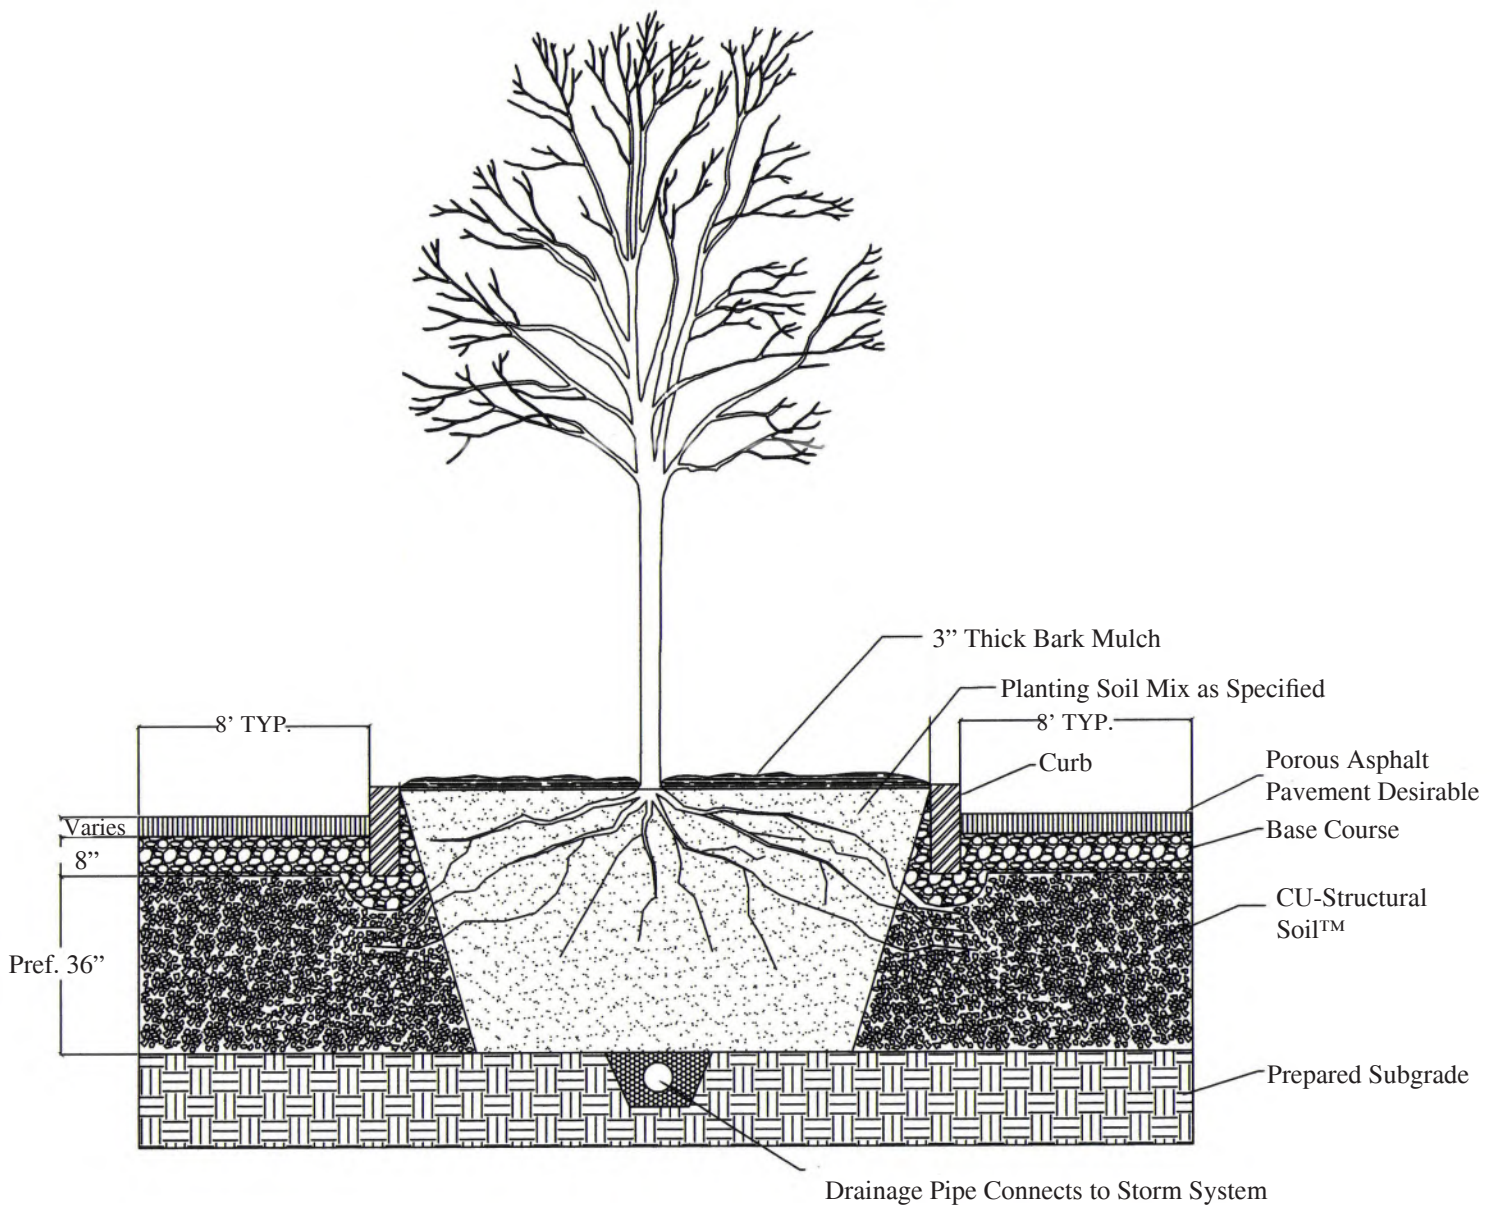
Bare root tree in typical parking lot island or plaza
